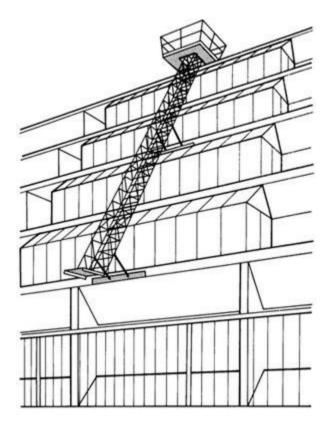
Window-cleaning apparatus necessary for complicated façades may become a permanent feature, affecting the appearance of the whole building.
